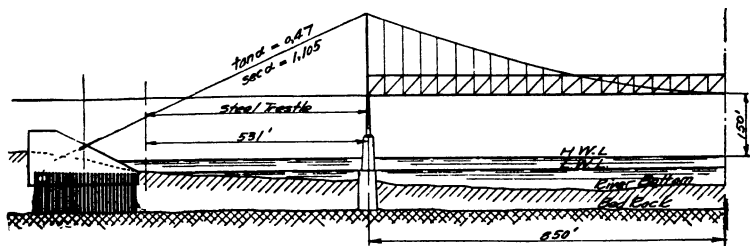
Layout for 1,700-foot Span Suspension Railway Bridge.
